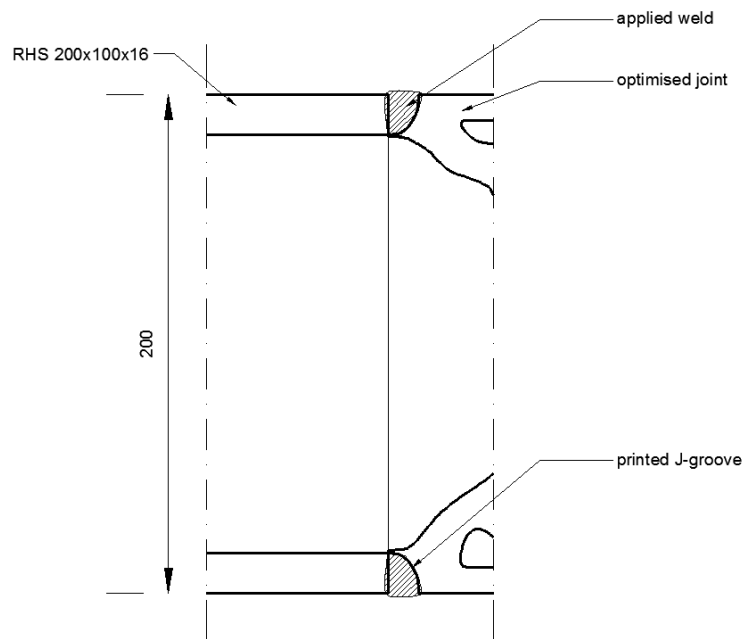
Welded connection between a RHS member and an optimized joint.
